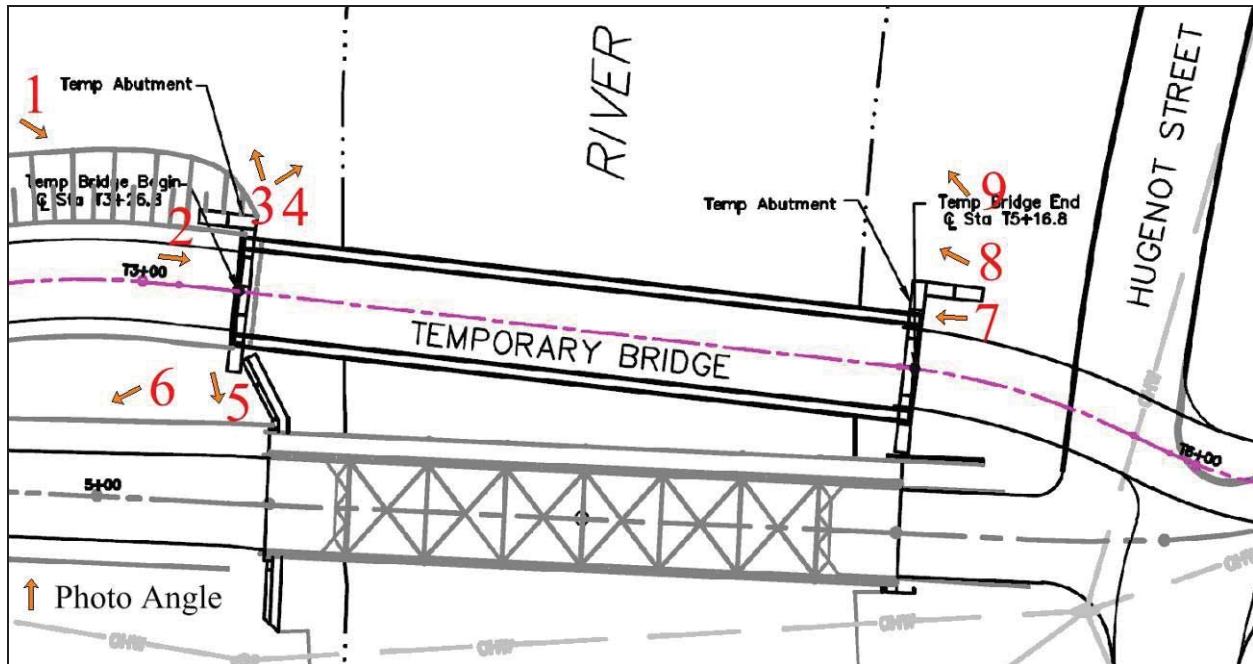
PROPOSED SITE PLANS ALONG WITH PHOTOGRAPH LOCATIONS.
